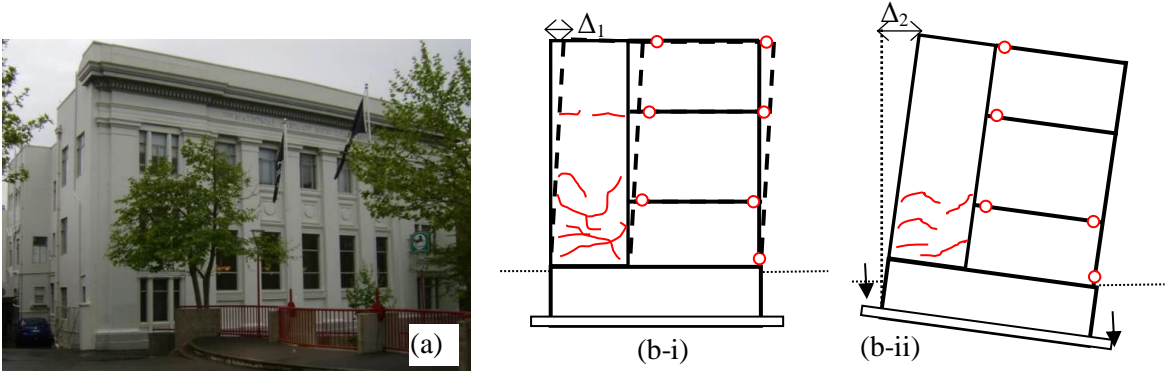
a) Low-rise reinforced concrete walls building on liquefiable flat ground; b) Dual wall-frame structure with rigid basement wall: i) Fixed based assumption ii) SFSI likely behaviour
